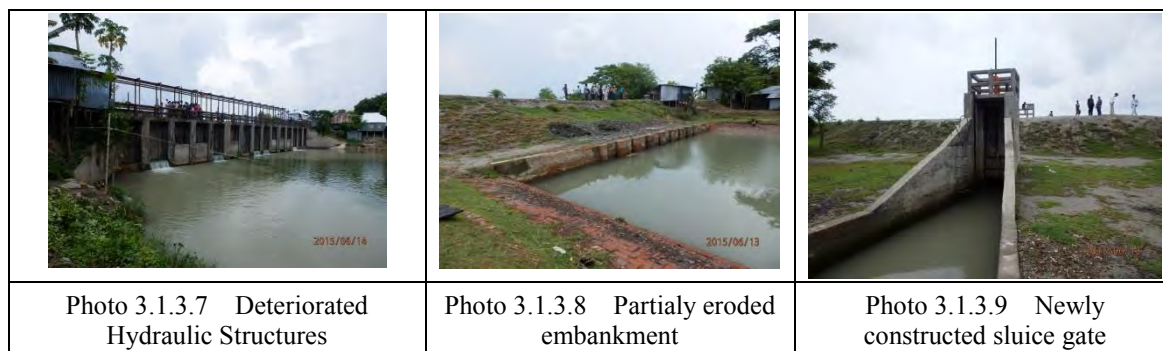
Photos of Damaged Hydraulic Structures
